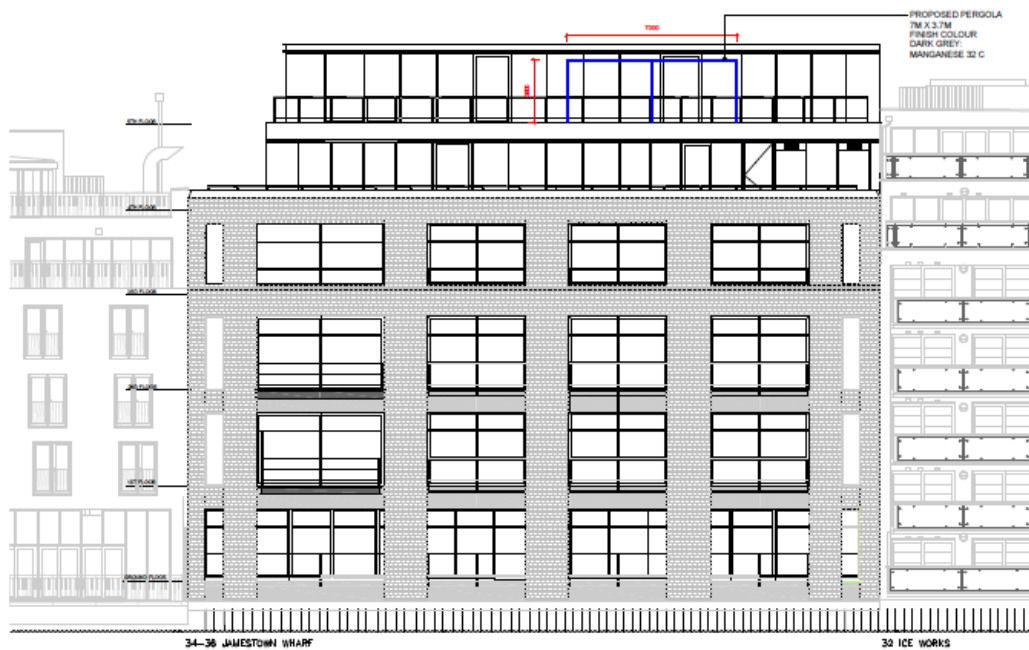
Proposed North Elevation Subject to Non-Material Amendment.
